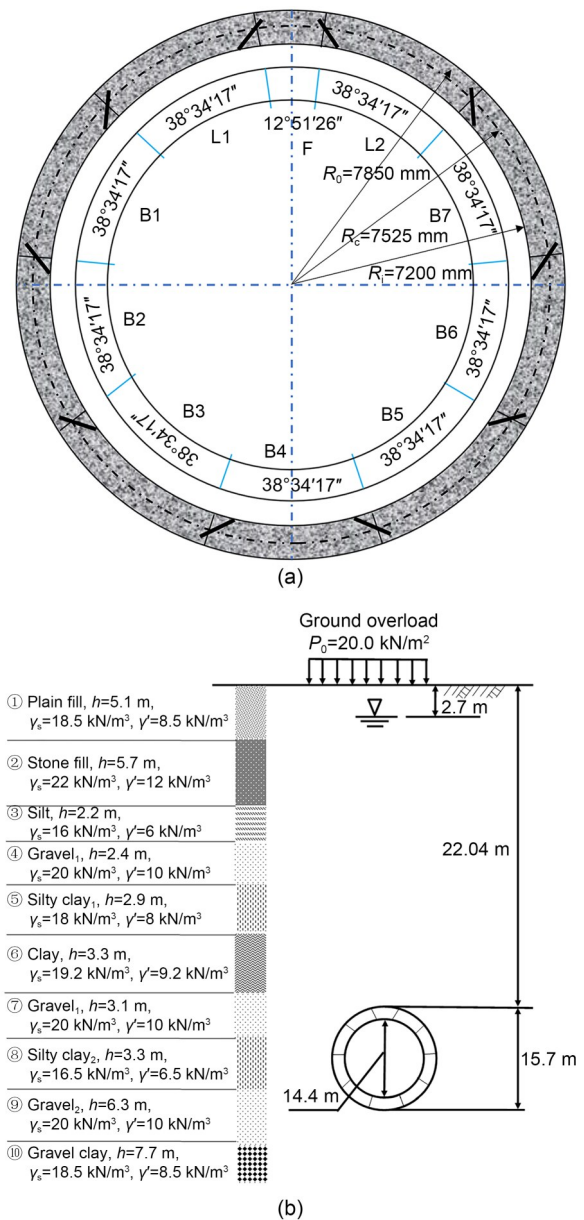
Wanghai Road Tunnel reinforced concrete segment design: (a) reinforced concrete segment block diagram; (b) outline drawing of stratum design. F: key segment; L1, L2: adjacent segments; B1–B7: standard segments; h : thickness of the soil layer (m); γ_s : saturation weight (kN/m³); γ' : buoyancy weight (kN/m³)
